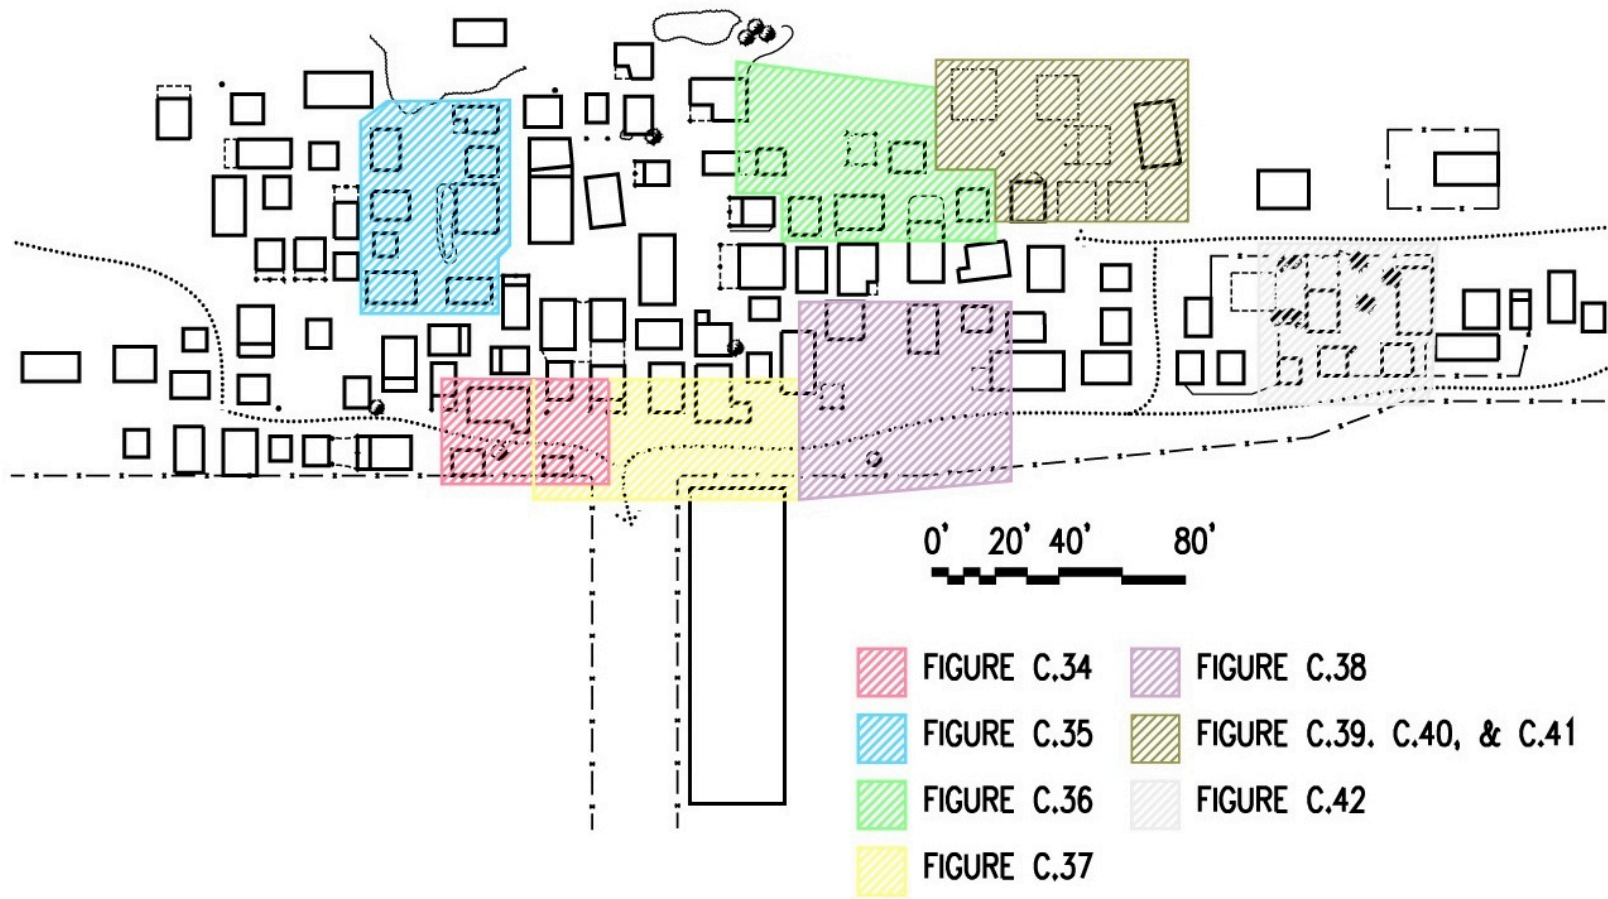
Site plan of Sugar Canaan with legend key highlighting areas under observation.
